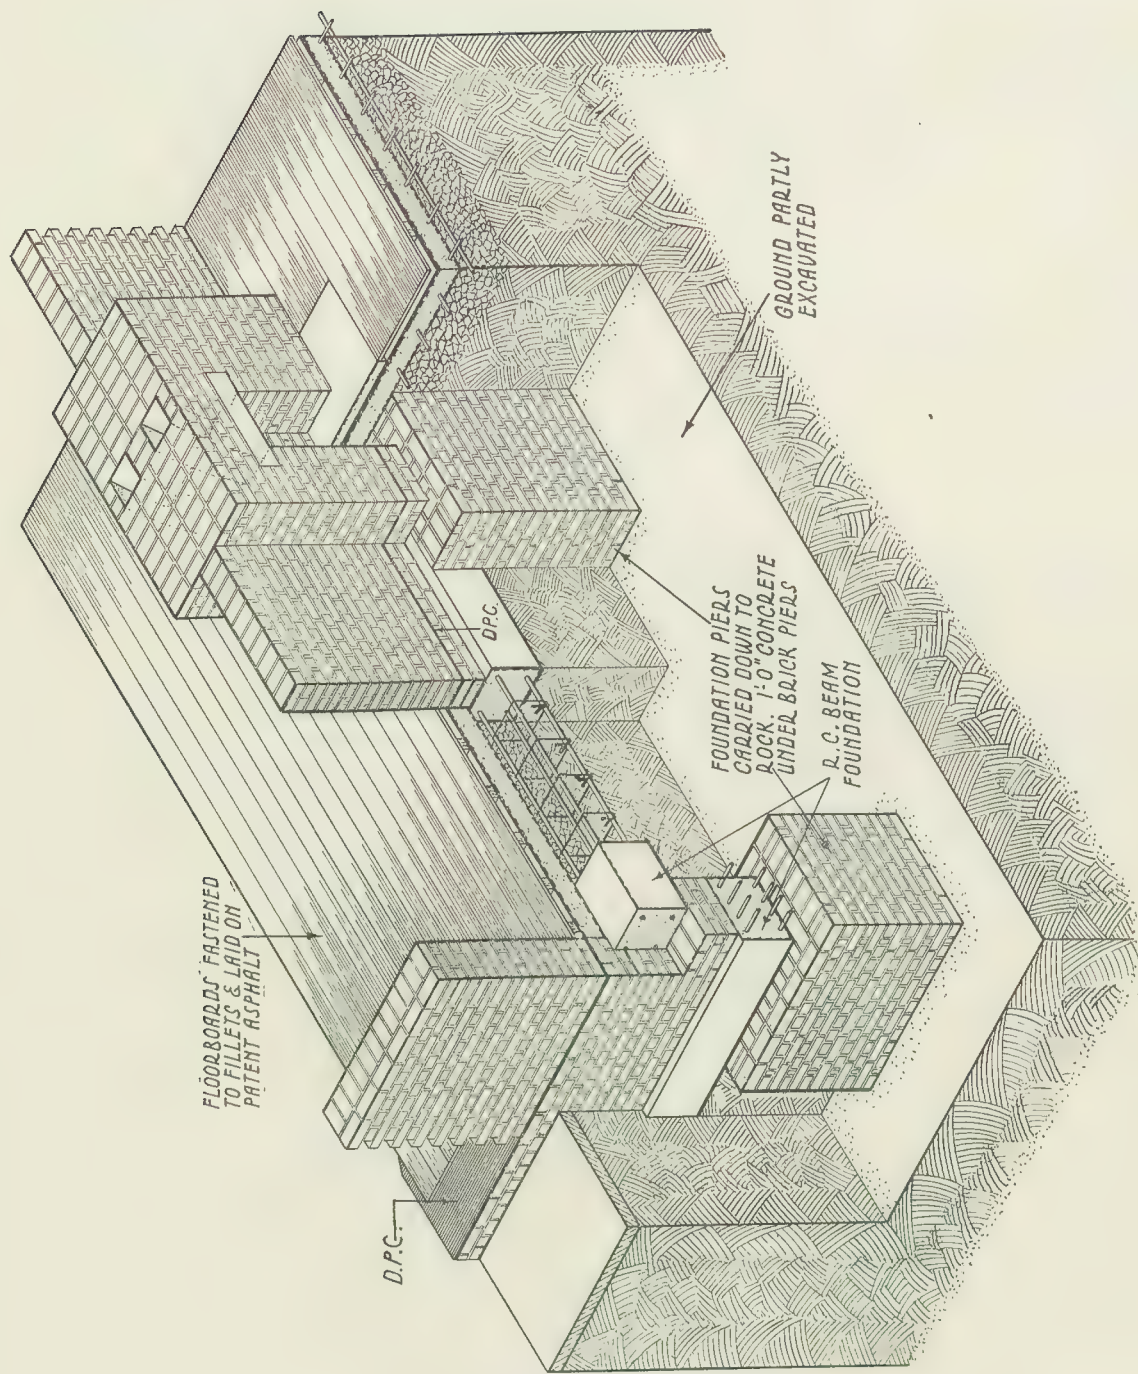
REINFORCED CONCRETE BEAM FOUNDATIONS RESTING ON BRICK PIERS
